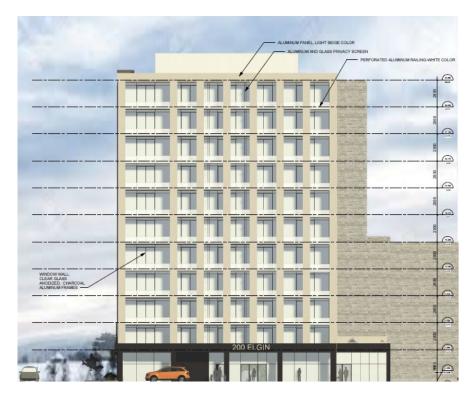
Elgin Street elevation which depicts the proposed inset balconies for the new residential units above the ground floor.
